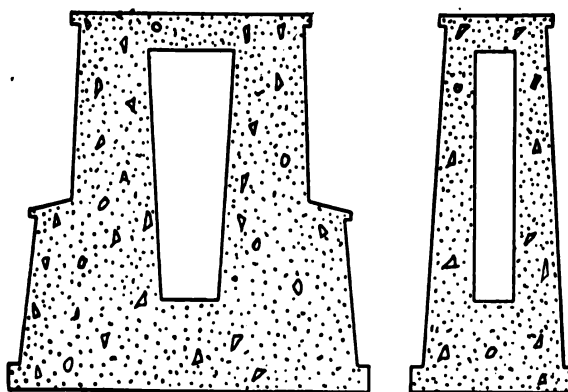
Hollow spaces in piers (Spalding 1921).
